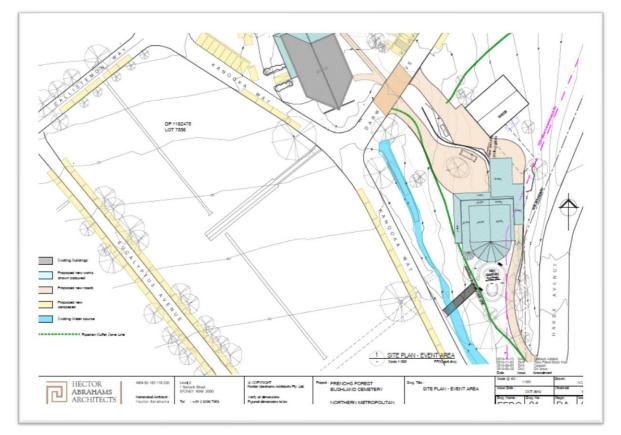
Excerpt from proposed Site Plan - event area (plan no. FFBC, issue 6). (Client, 23 March 2020)
